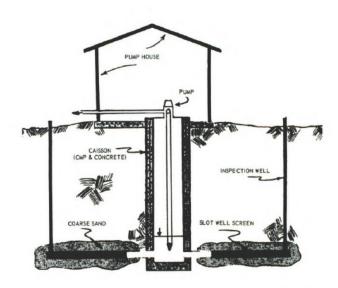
shows how a dug well of this type is equipped with a power-driven pump, so that a constant supply of water can be maintained in tanks or other types of reservoirs. The long shaft below the pump is called a well point. Instead of being dug, the hole for the well point might be bored, drilled, or jetted out. In a ''driven'' well the well point is simply driven down to the water table.
